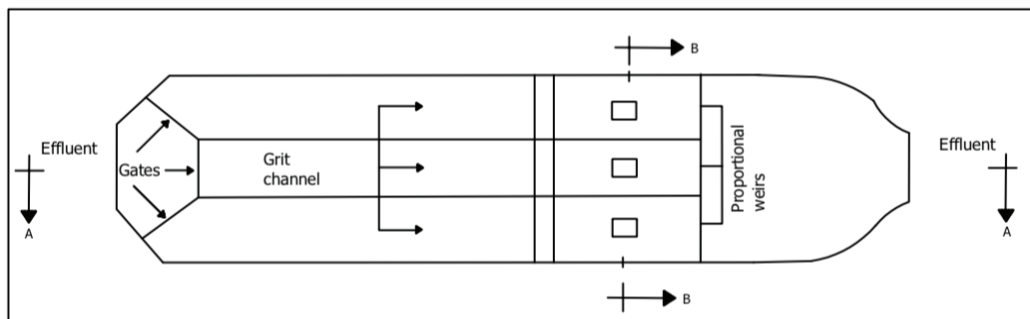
The Schematic Layout Plan of a Grit Chamber with Proportional Sutro Weir
